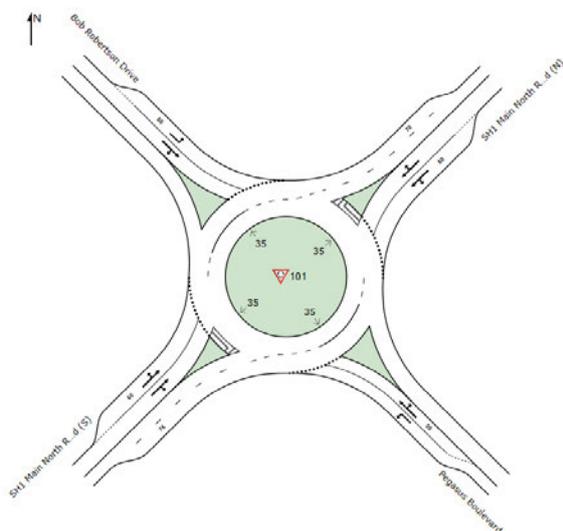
Previously Proposed Pegasus Roundabout Layout
